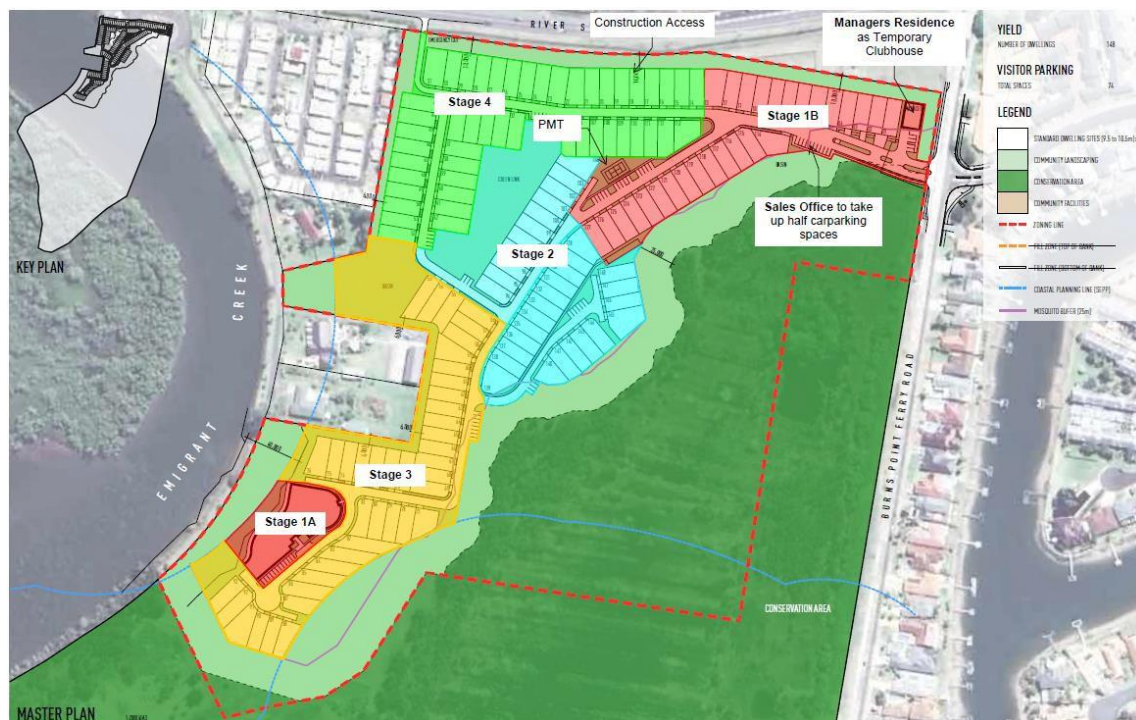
Staging Plans (Source: Applicant's Staging Plan)
